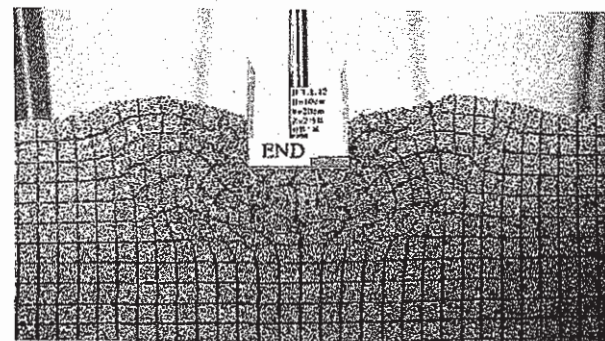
Failure mechanism of reinforced foundation ground (reinforcing material: paper,  $b/B=2.0, z/B=0.4, S/B=0.5$ ).
